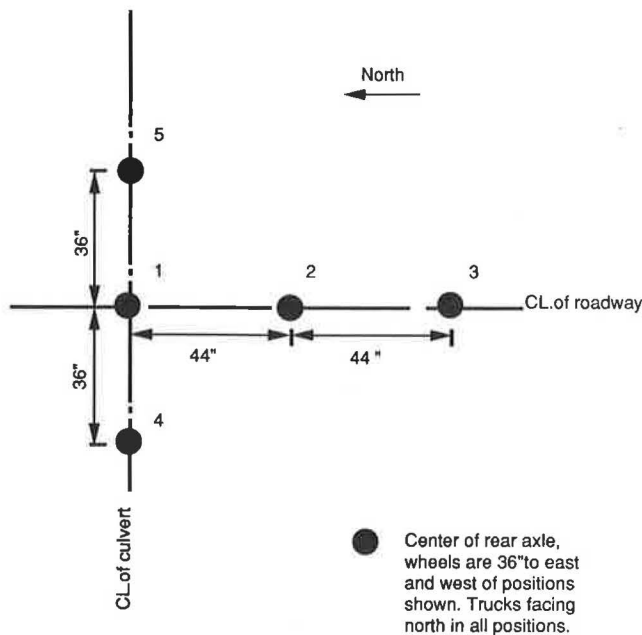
Live load application points (center of rear axle; wheels are 36 in. east and west of positions shown; truck facing north in all locations).
